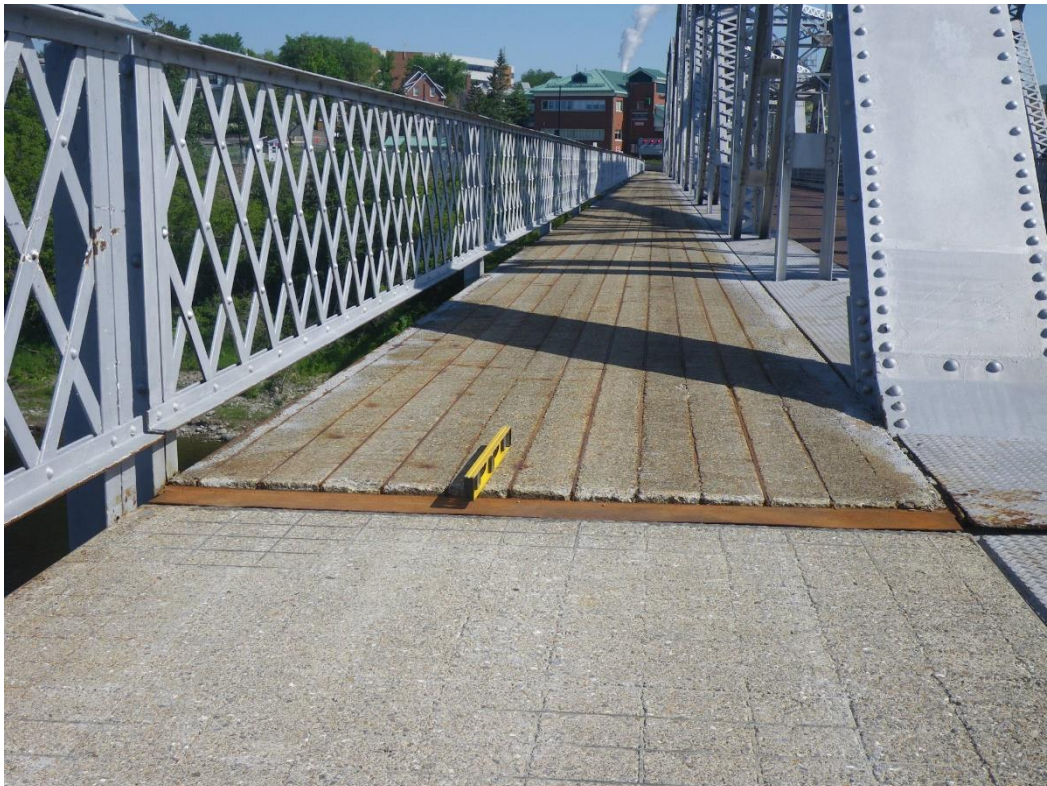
Deck Top of Sidewalk at Pier 2, Spans 2 and 3, Looking North - Vertical differential between spans.
